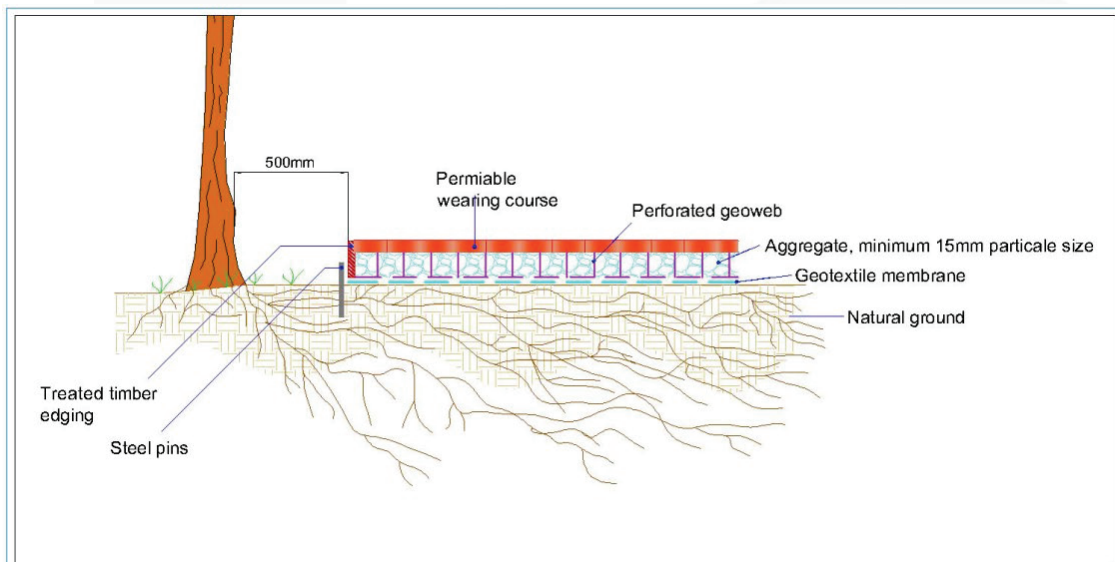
Typical cross-section for multi-dimensional confinement system using timber edging
